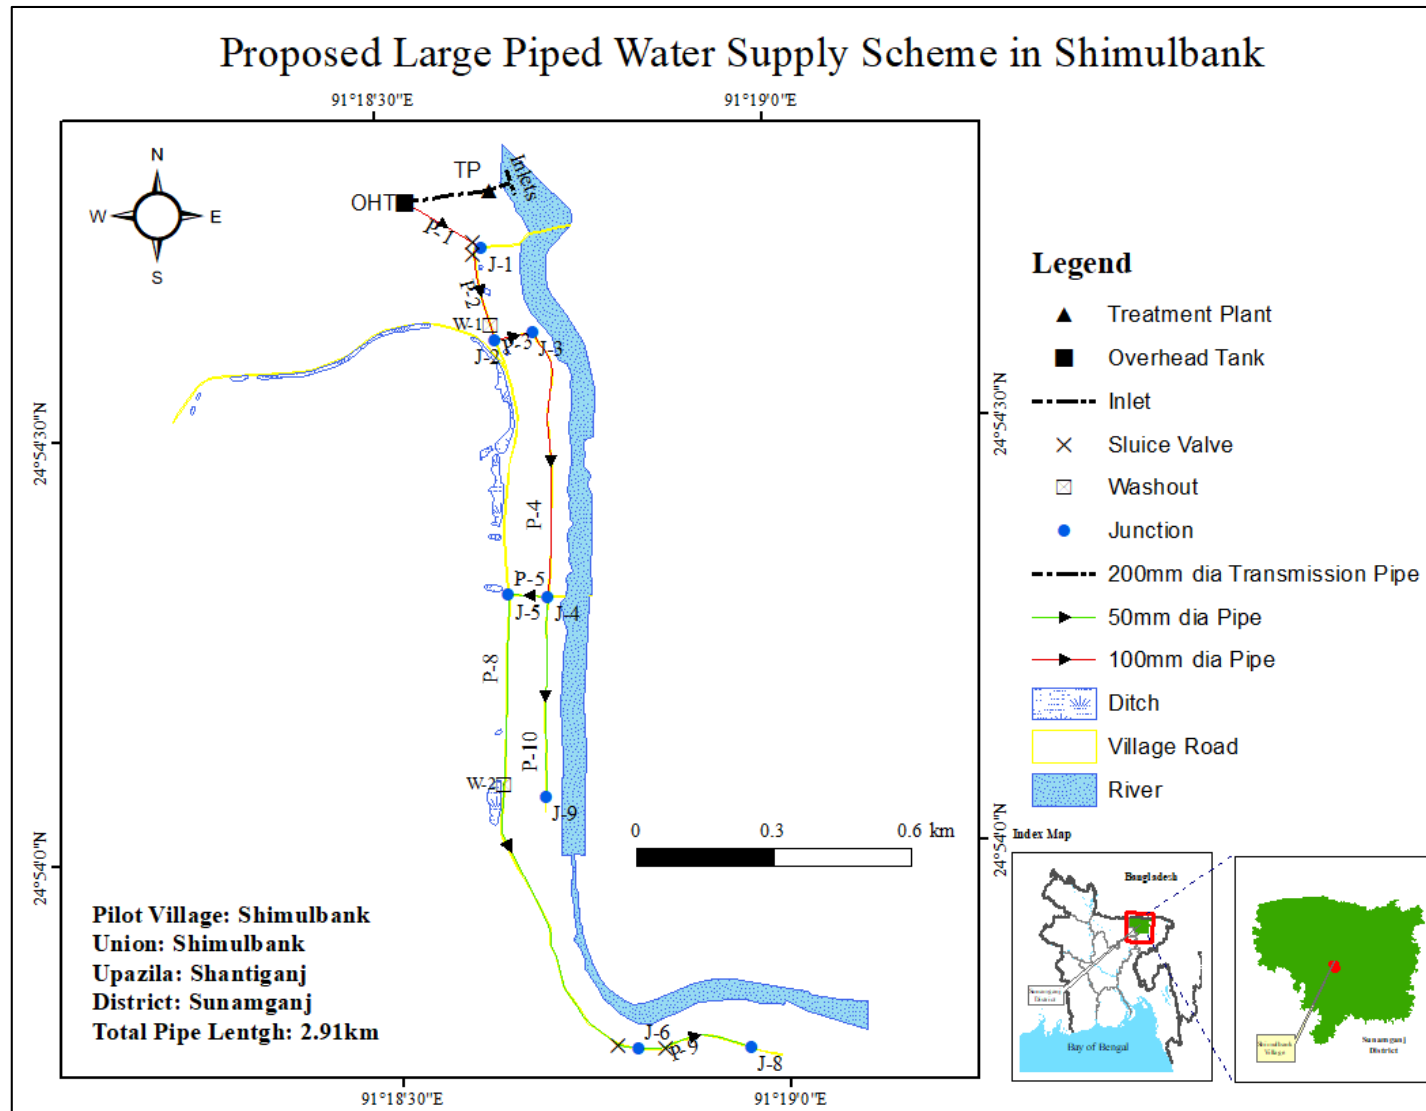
Detailed Pipe Network for Piped Water Supply Scheme in Shimulbank Village
